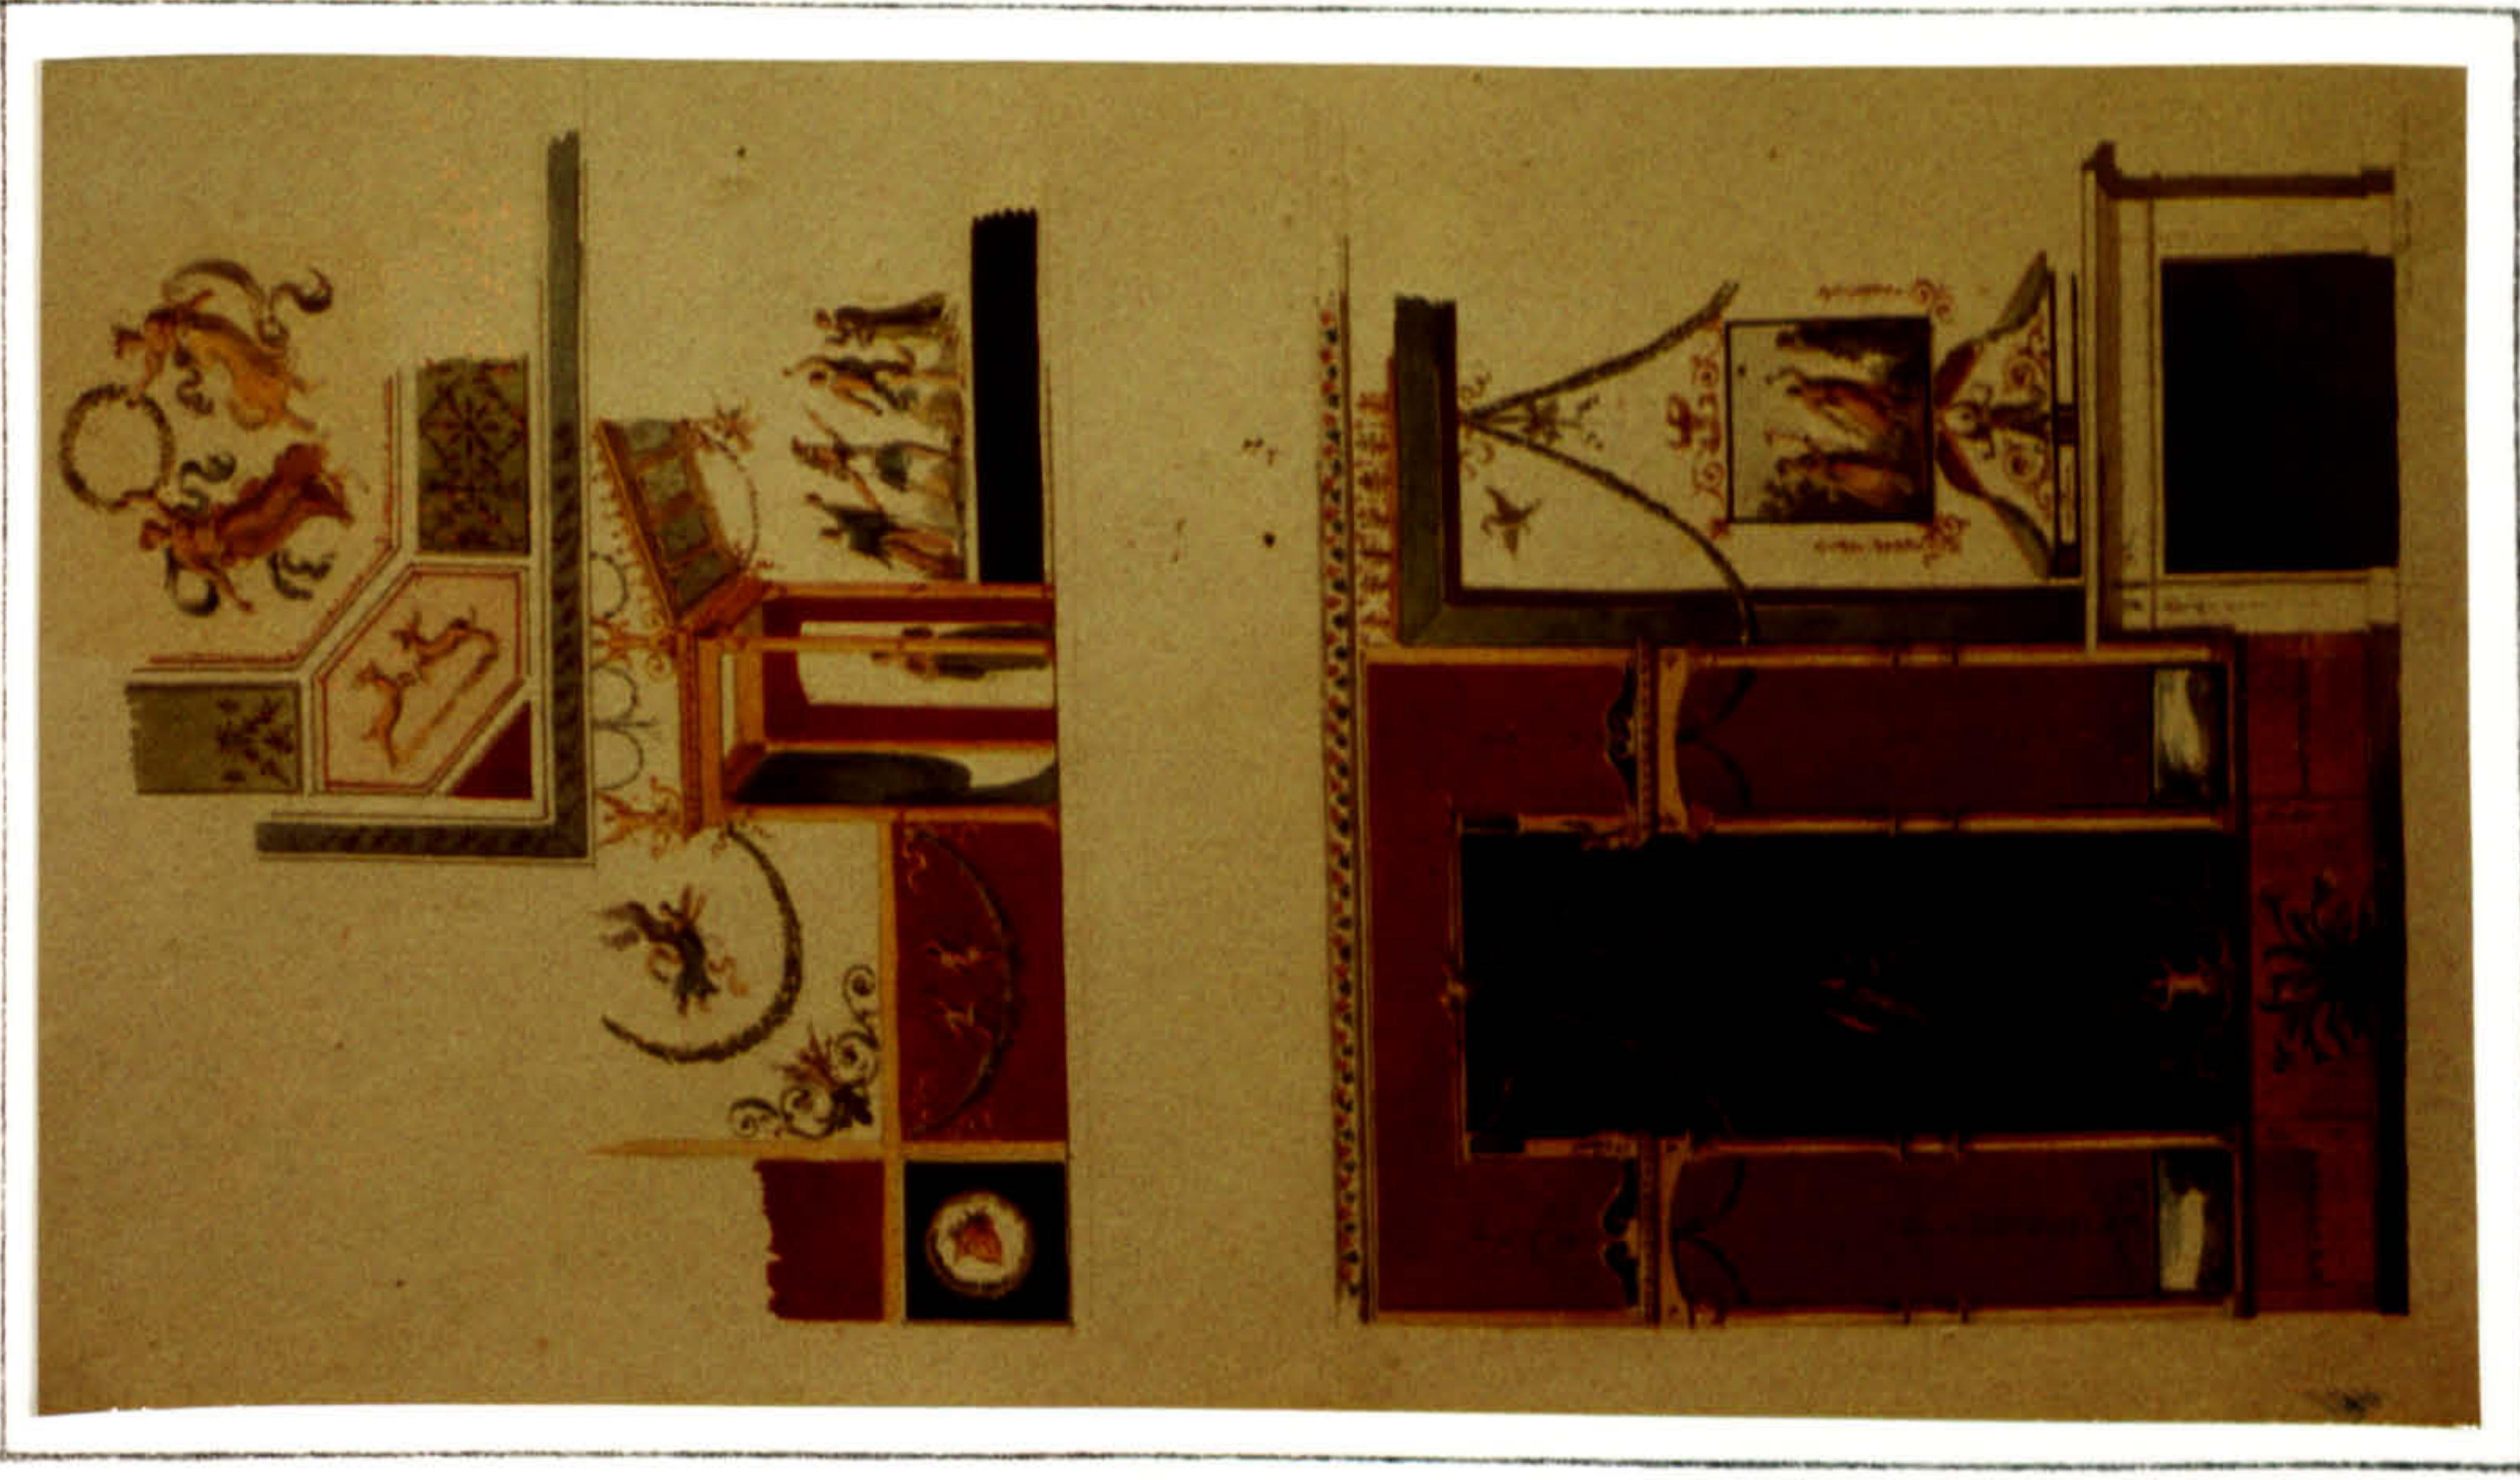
ALEXANDER DOOS · ELEVATION AND CEILING DESIGN · 1833
